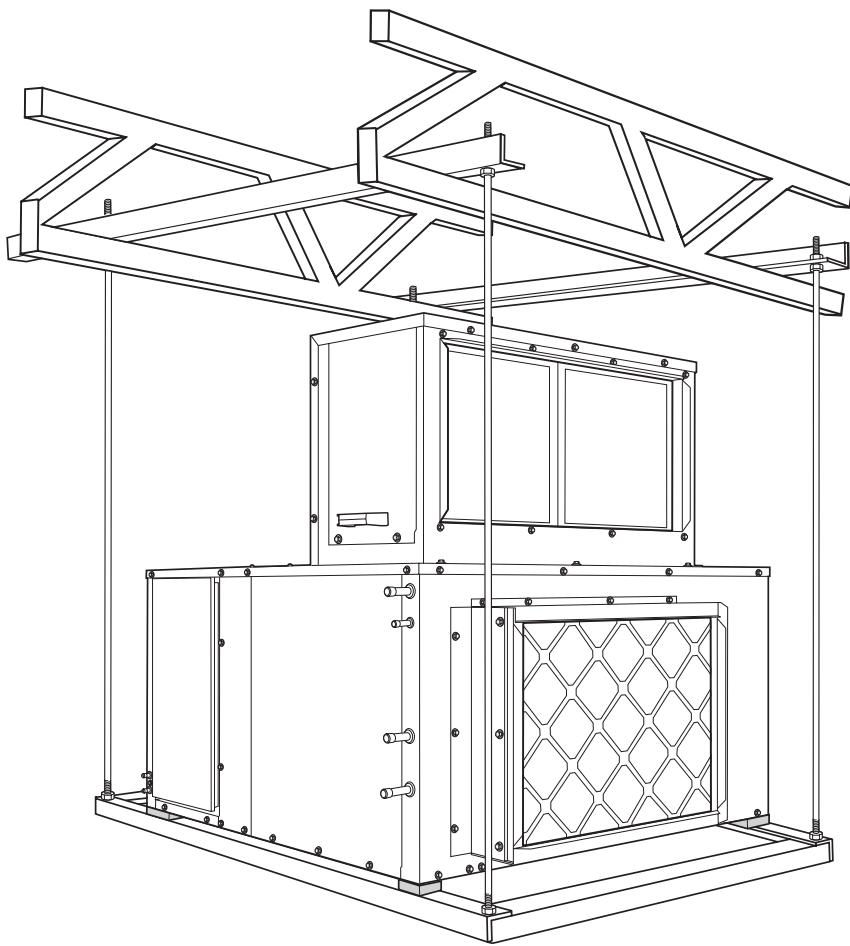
Typical Suspended Installation - LC Only (LV Units are floor units only)
